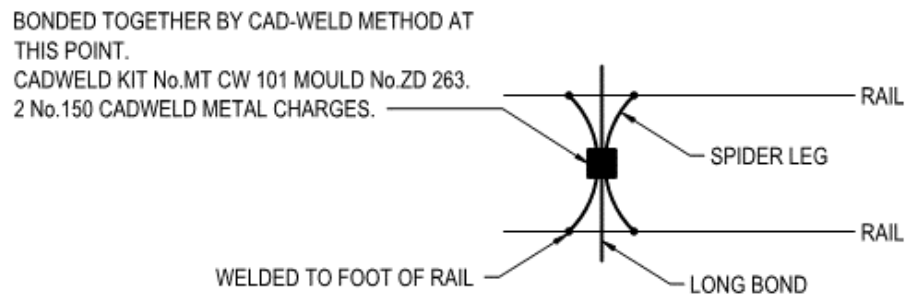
Duplicate Long Bonds Installation Detail.
